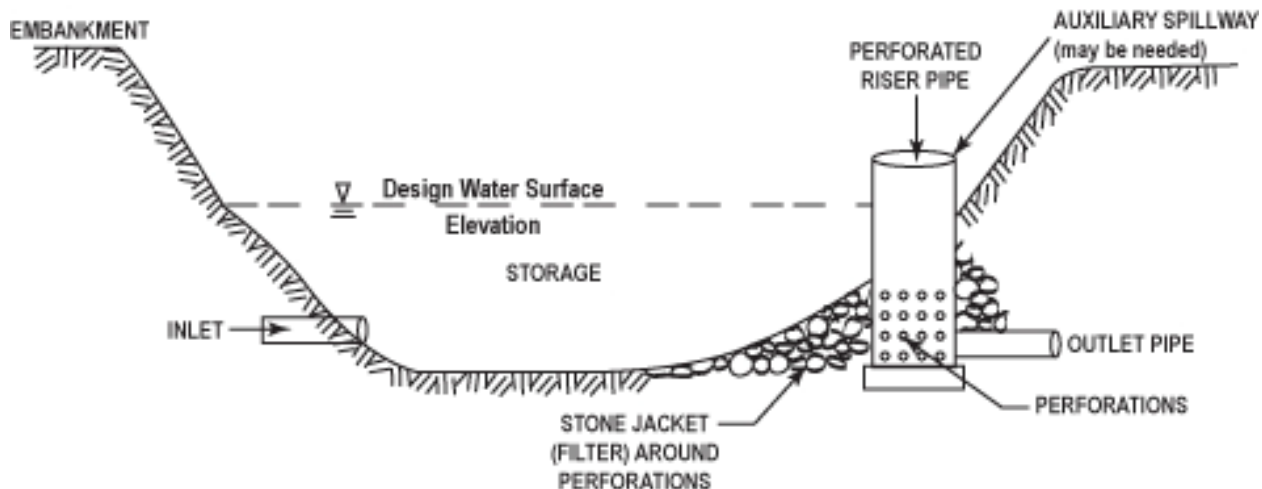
Perforated Pipe with Riser Tube Outlet
